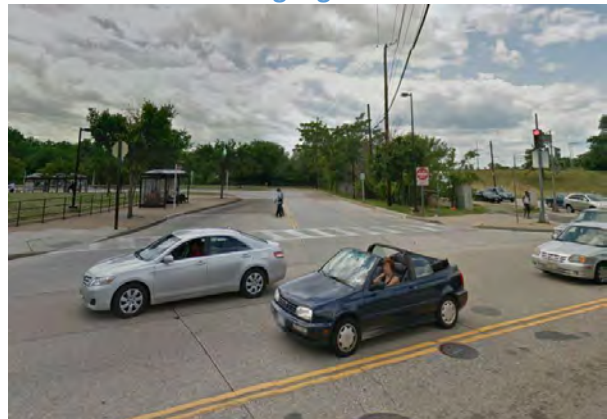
"Do Not Cross Use Crosswalk Sign" on Howard Road
